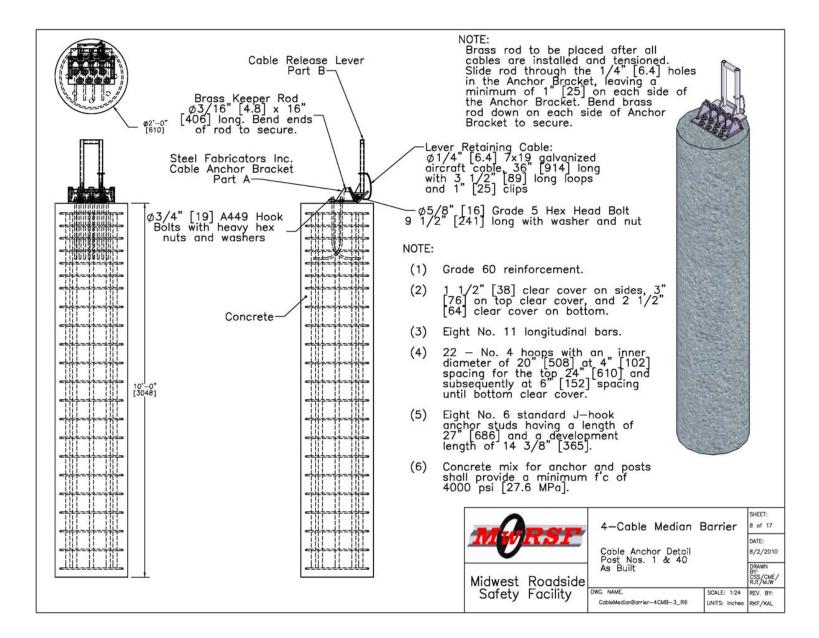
Cable Anchor Detail, Post Nos. 1 & 40, Test No. 4CMB-3
